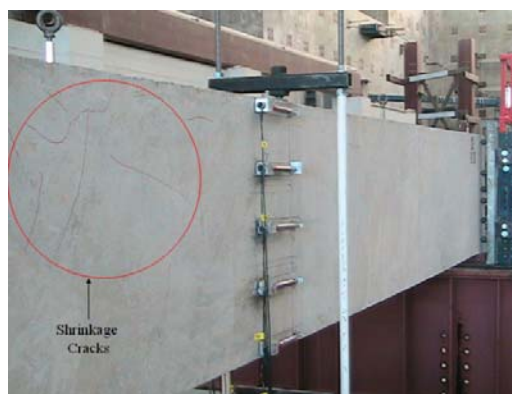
Shrinkage cracking of test beam B30 prior to testing
